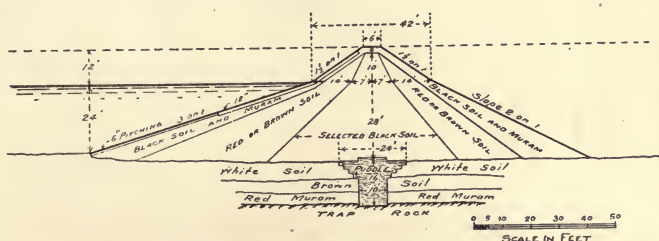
CROSS-SECTION OF ASHTI TANK EMBANKMENT.
